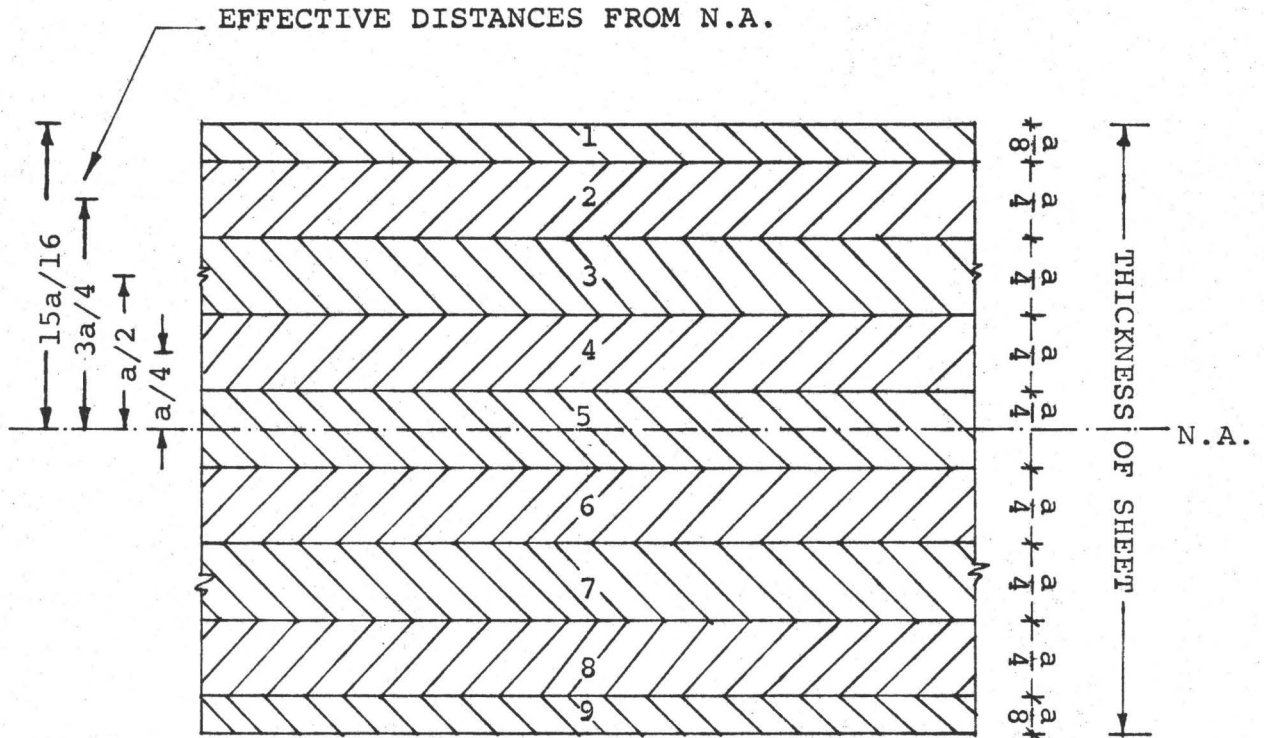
ARRANGEMENT OF ELEMENTS
